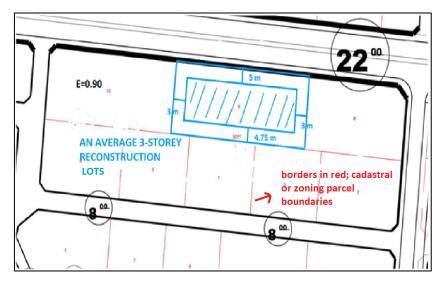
A Reconstruction Lots with a Total Construction Value of 0.90
